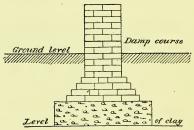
Foundation of Two-brick Wall in Light Soil.
